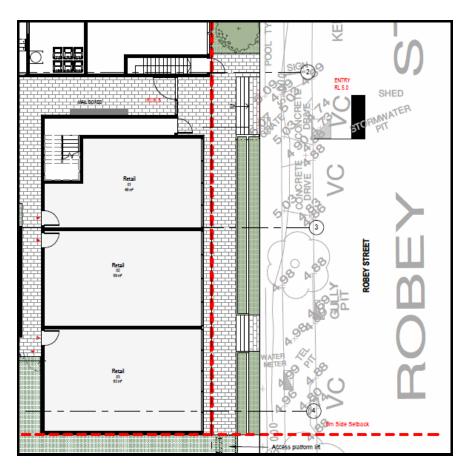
Proposed Commercial Development on Ground Floor (Source: Brewster Murray, 13 October 2017)
